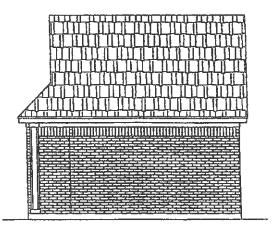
EXHIBIT E ILLUSTRATIONS OF UNIT ELEVATIONS (6 SHEETS)
